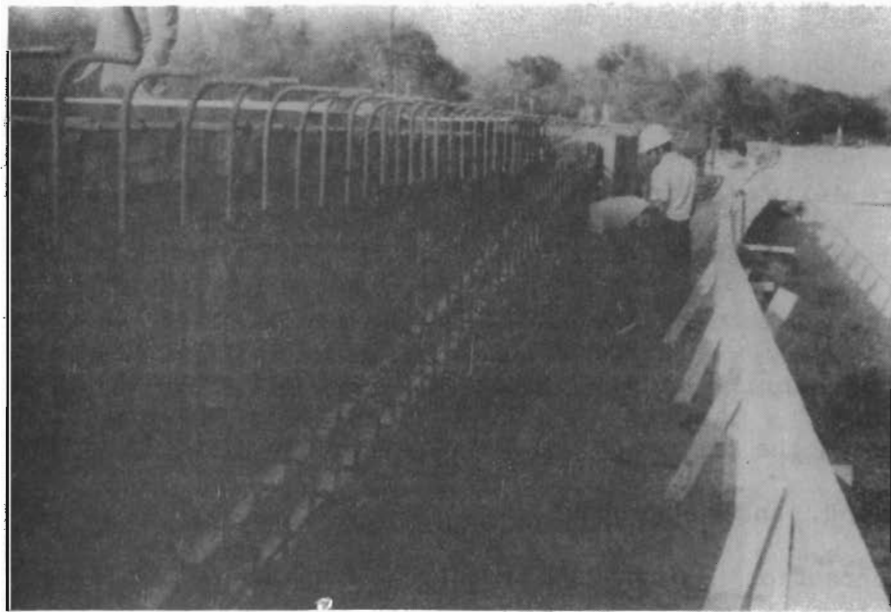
Spine beam web reinforcement and post-tensioning ducts
